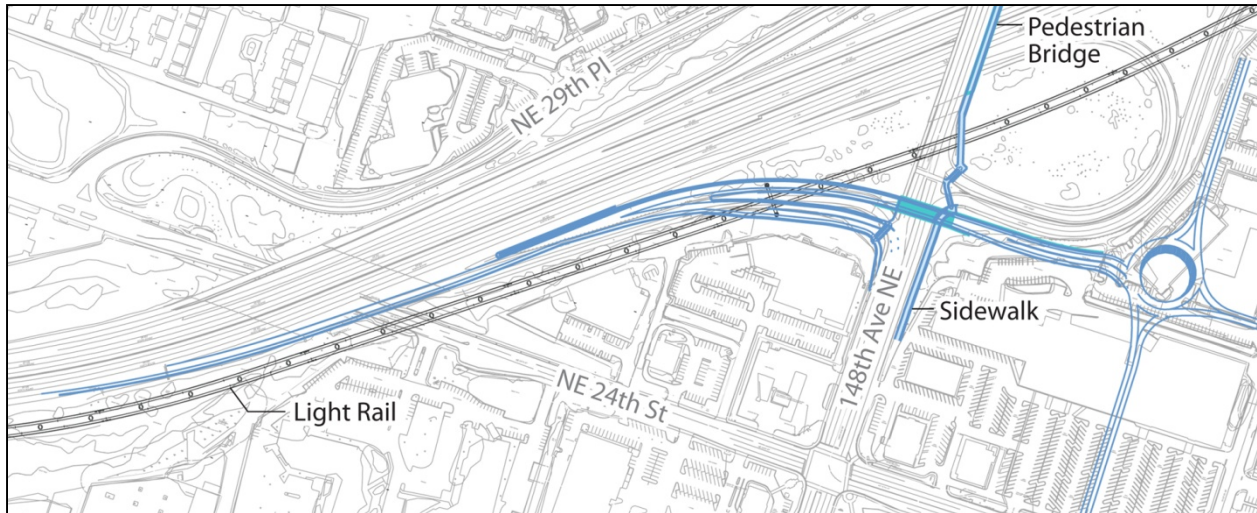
Overlake Access Ramp Connection Alternative B – Tunnel North
